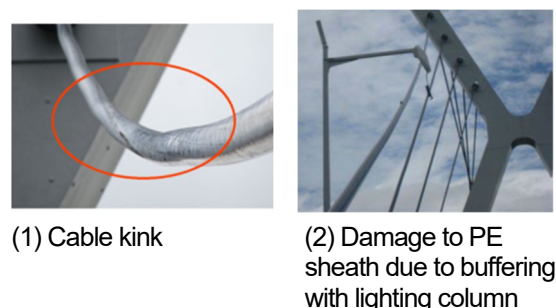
Deformation of cables identified during visual inspection of the Kuwatsuru Bridge
